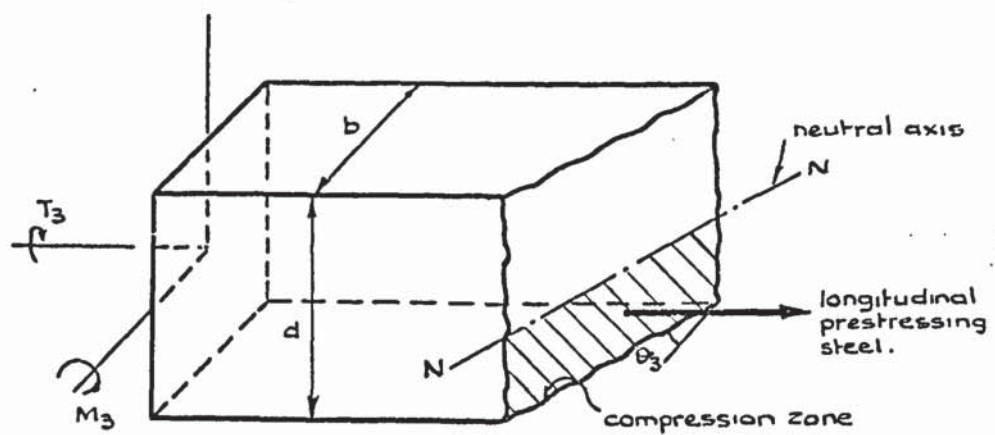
Mode 3 type failure in prestressed concrete (rectangular failure plane.)
